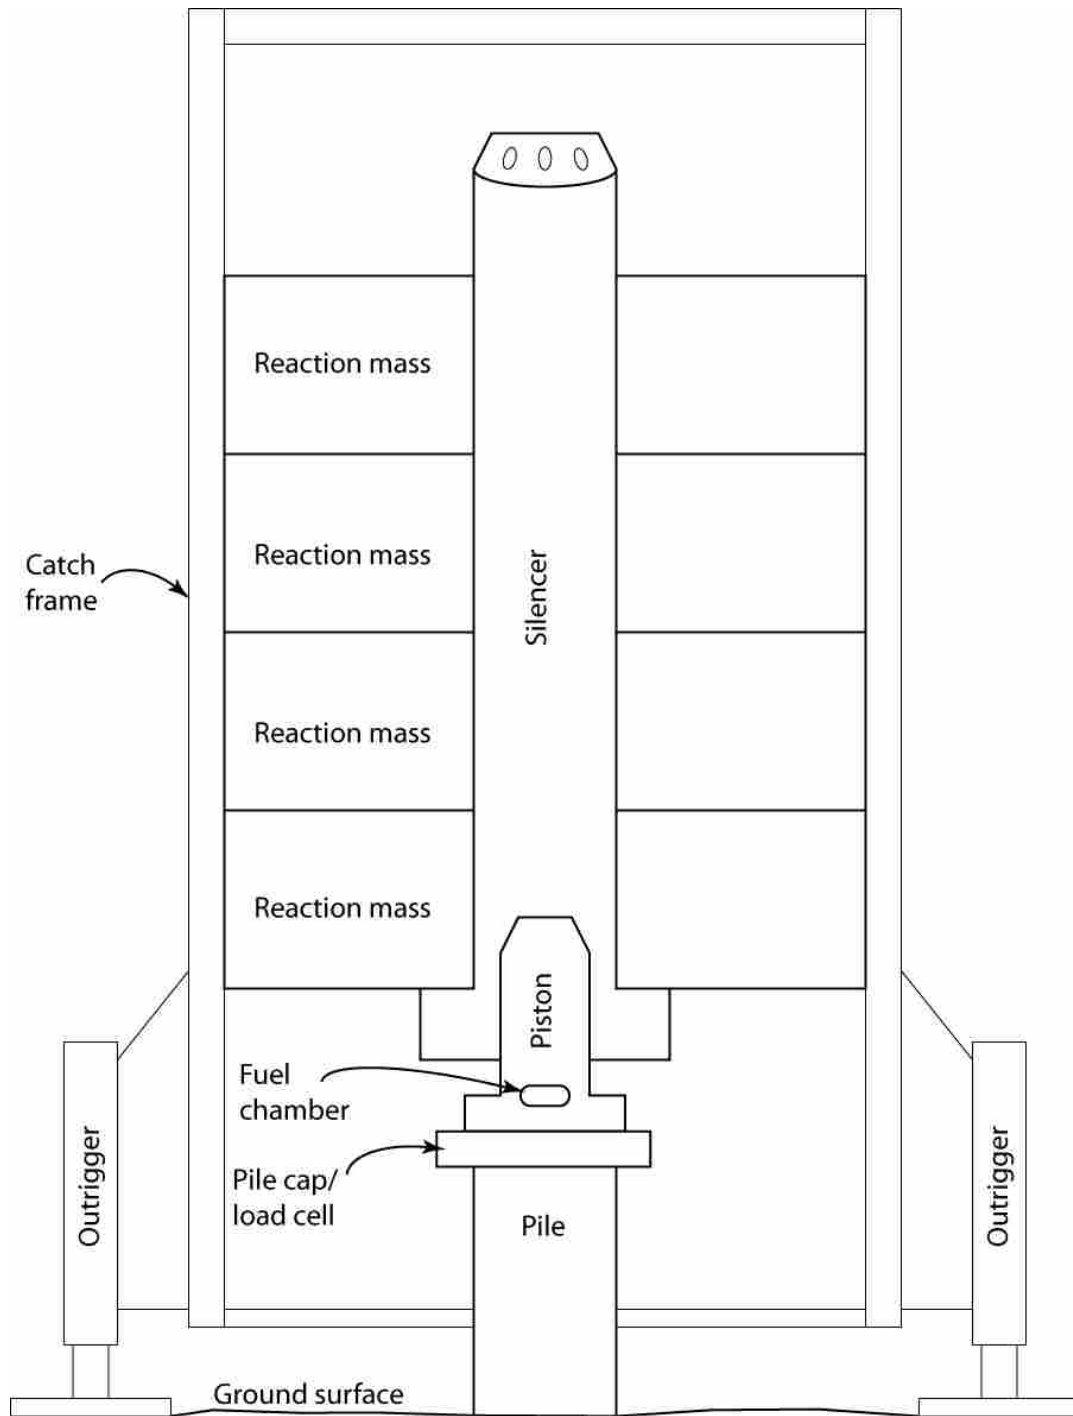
Schematic diagram of the static testing apparatus. Drawing not to scale.
